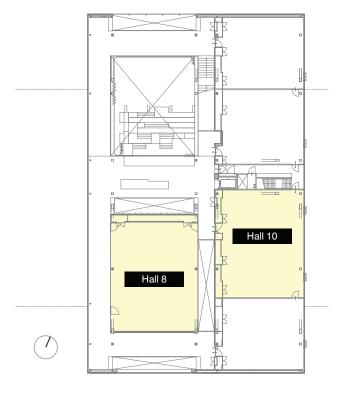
Hall 8 and Hall 10 in Pulse Building.
